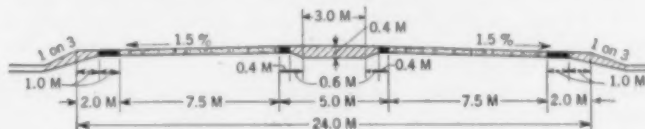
CROSS-SECTION SHOWING DIMENSIONS (IN METERS) OF THE REICHAUTOBAHNEN
